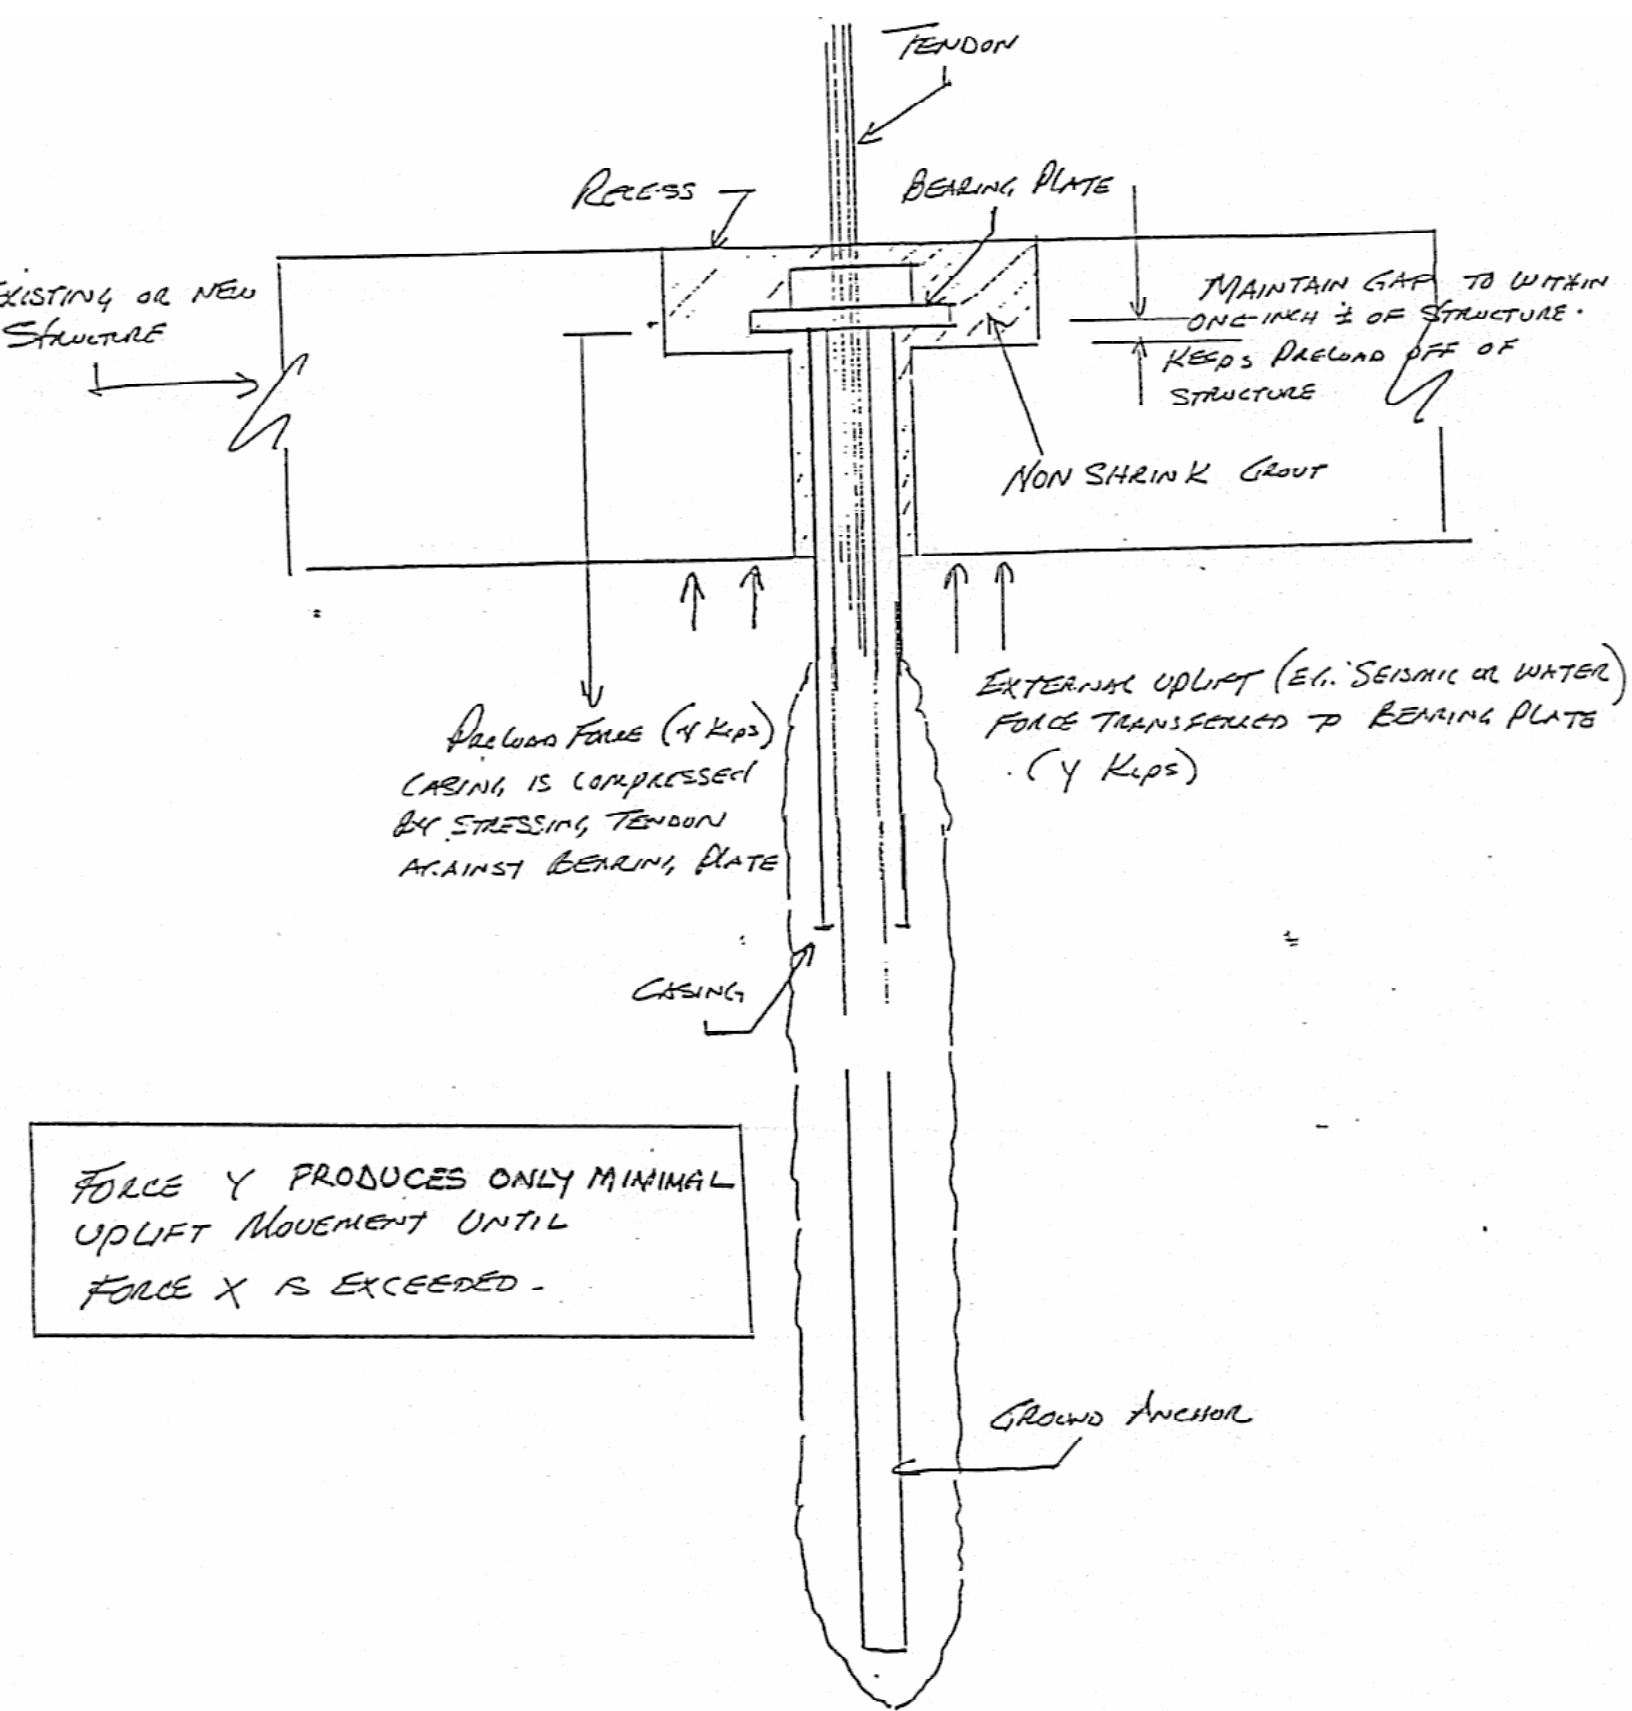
Sketch showing principle of Nicholson Compressed Anchor-PileSM.
